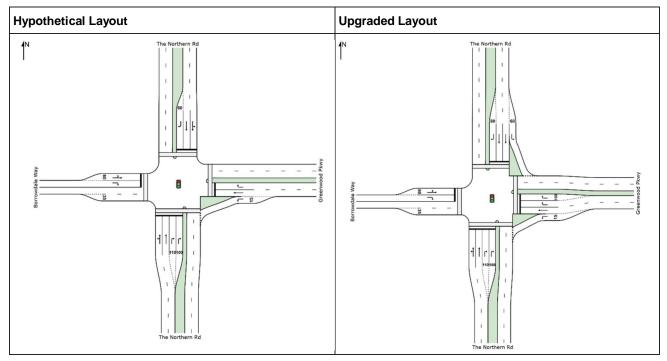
2021 with Links Road extension - The Northern Road/Borrowdale Way/Greenwood Parkway
